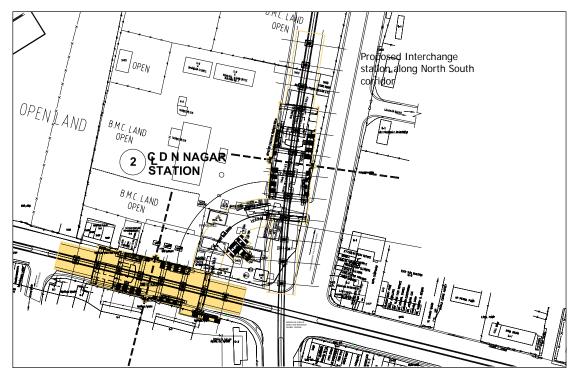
Proposed D N Nagar Station Area Development Plan
